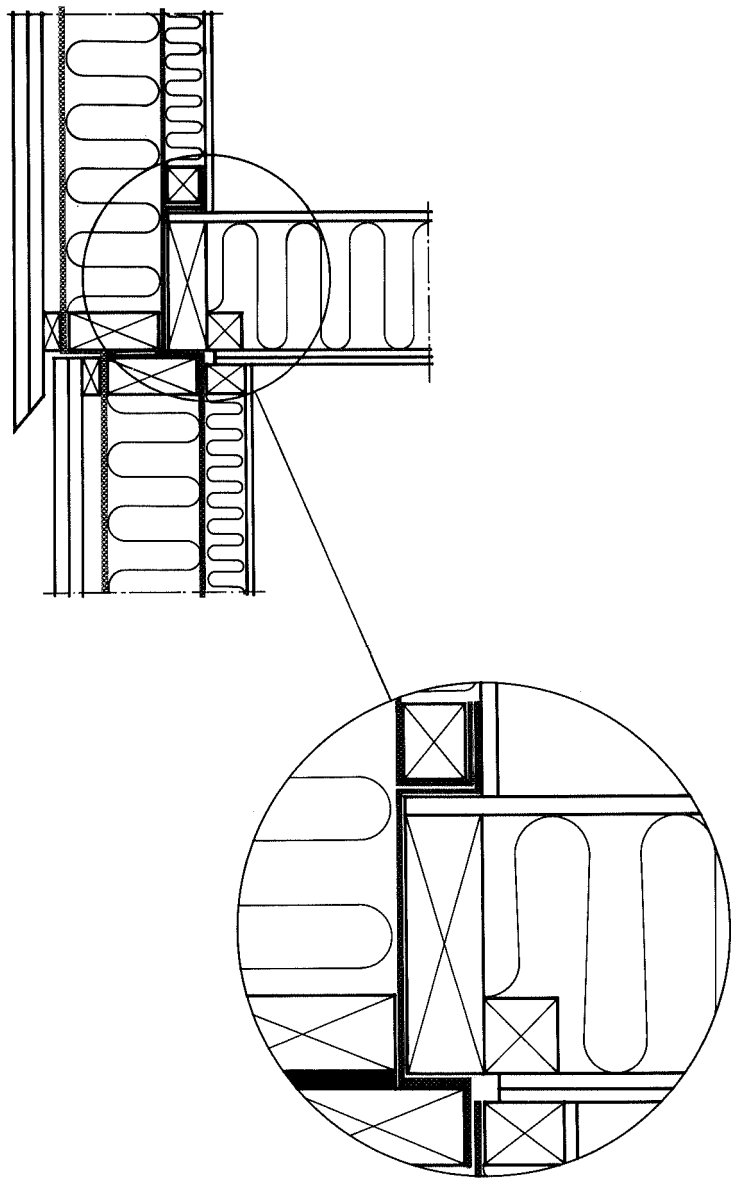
Joint between gable head, gable wall and intermediate joist structure in the case of a wall structure with »drawn-in« foil.
